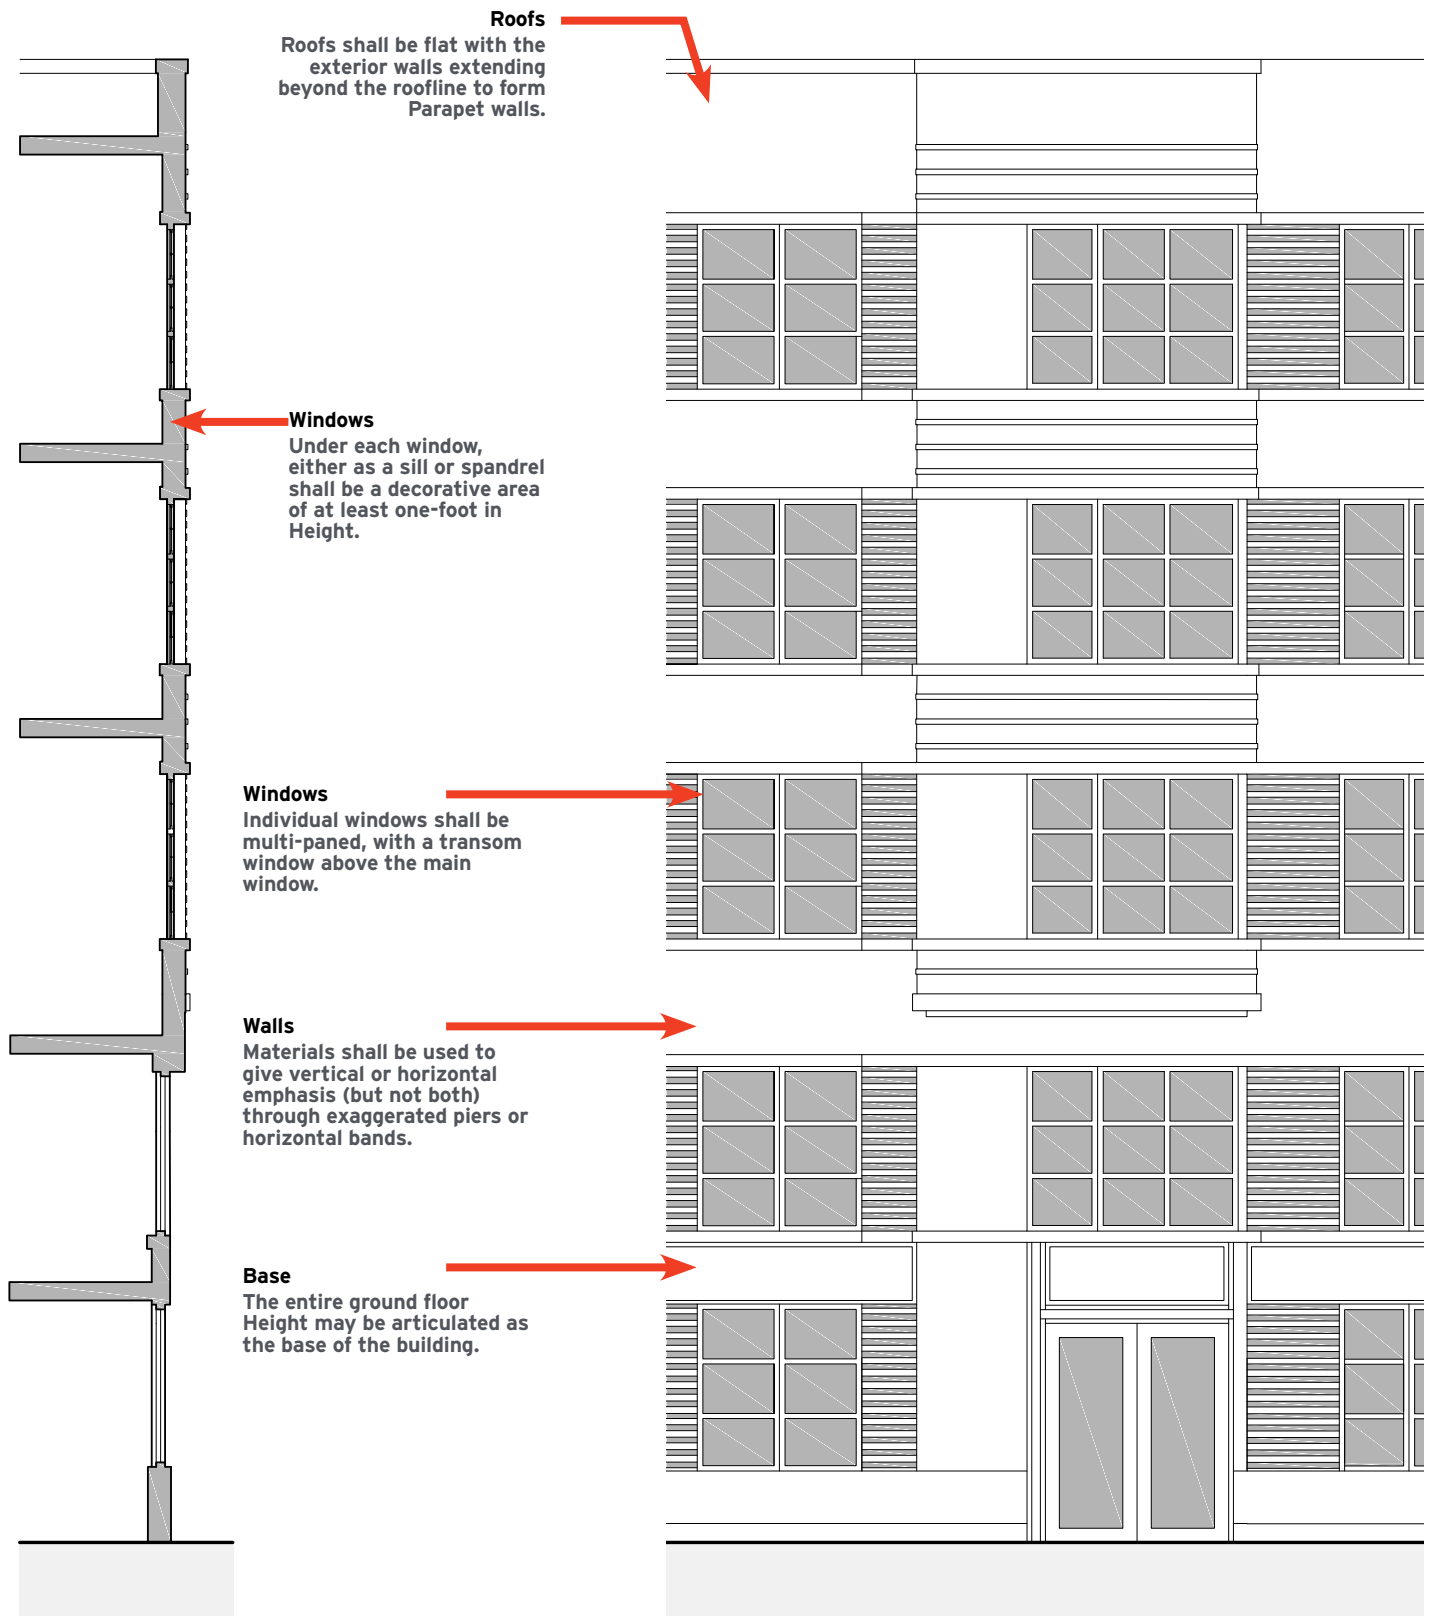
Art Deco Elements Diagram (Ground Floor Residential)
